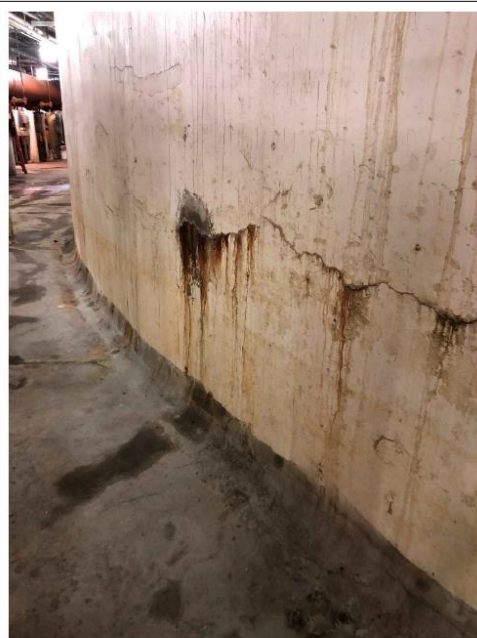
TYPICAL CRACK IN STT TANK WALL IN PIPE GALLERY
